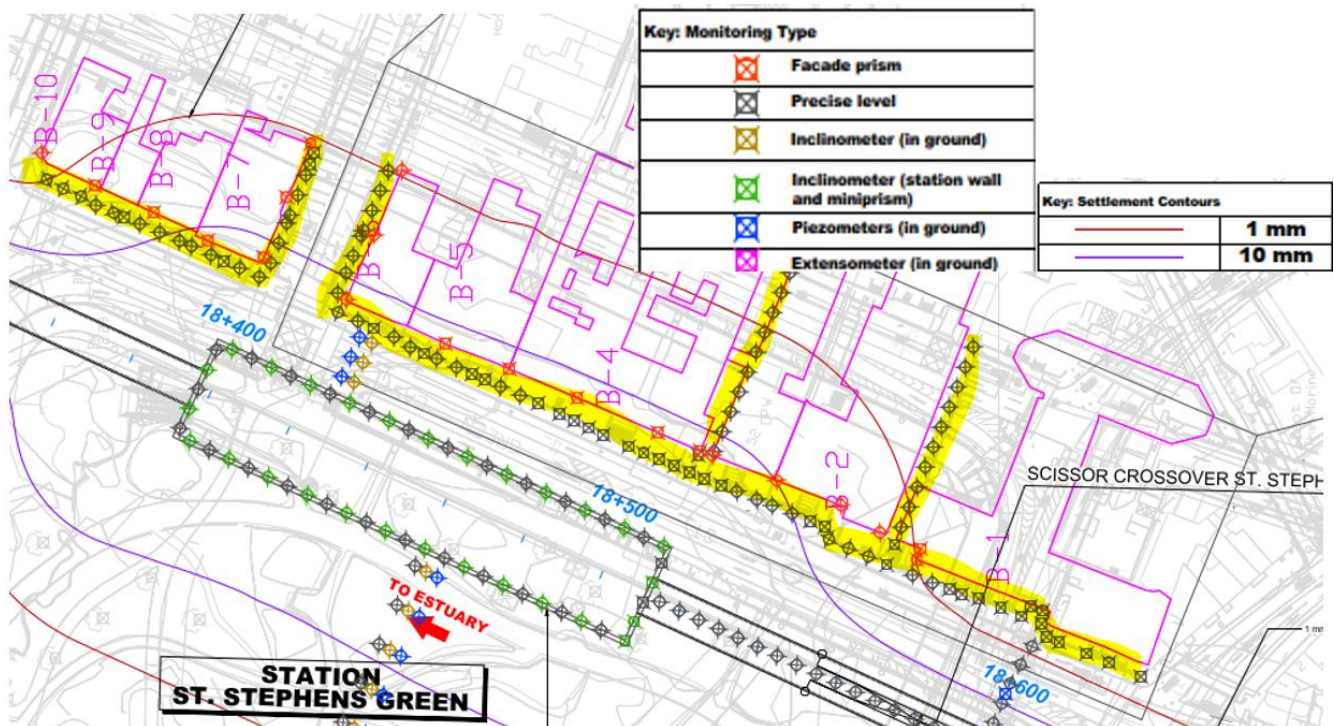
St Stephen's Green – Buildings Affected by Station Excavation (Including Building Façades requiring fixed monitoring, highlighted in yellow)
